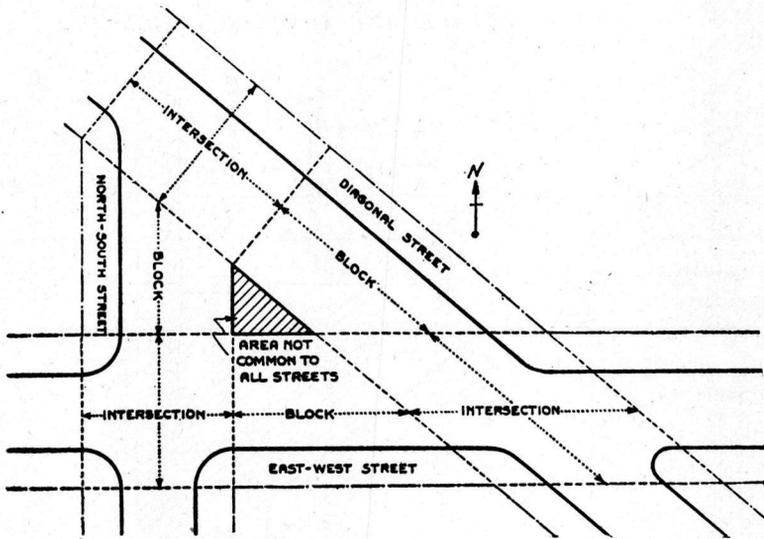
Apparent Multiple Intersection Divided into Component Blocks & Intersections
